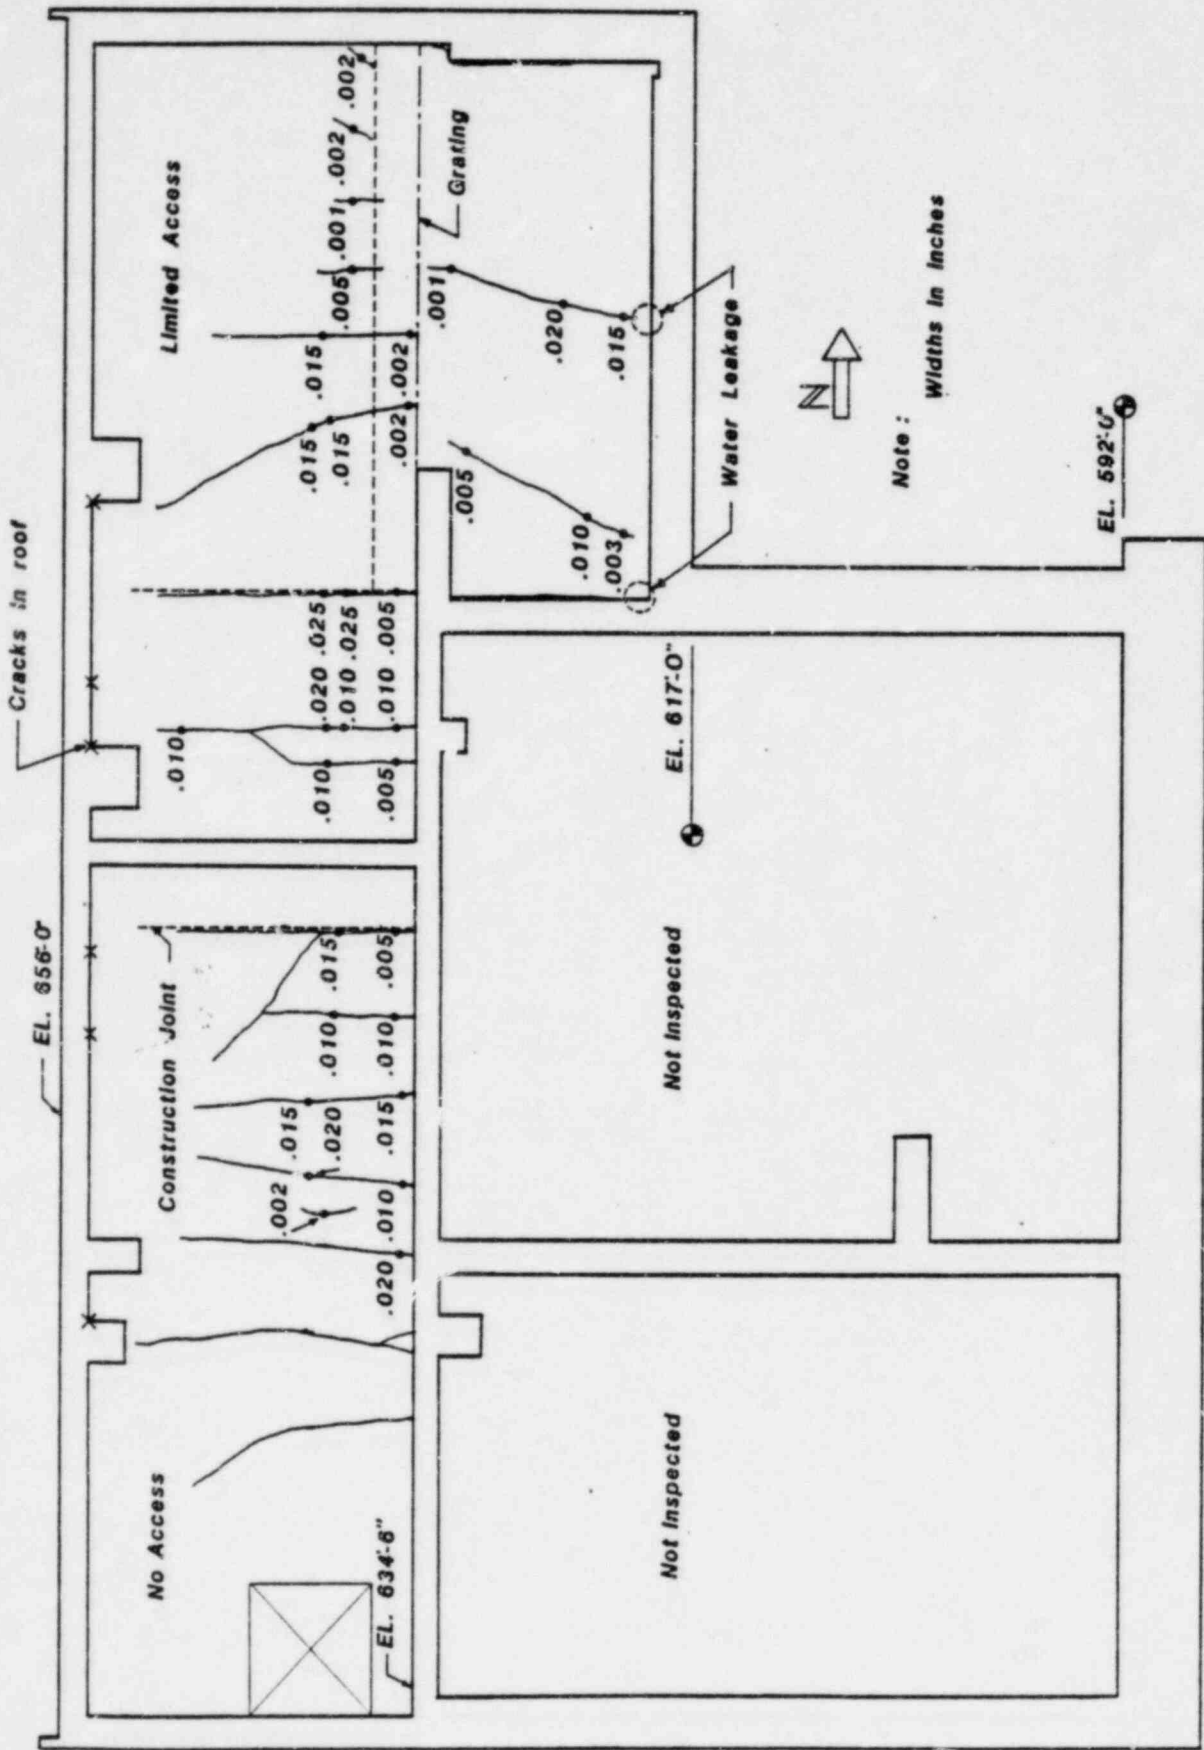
Cracks Observed in West Wall of Service Water Pump Structure on November 5, 1981
